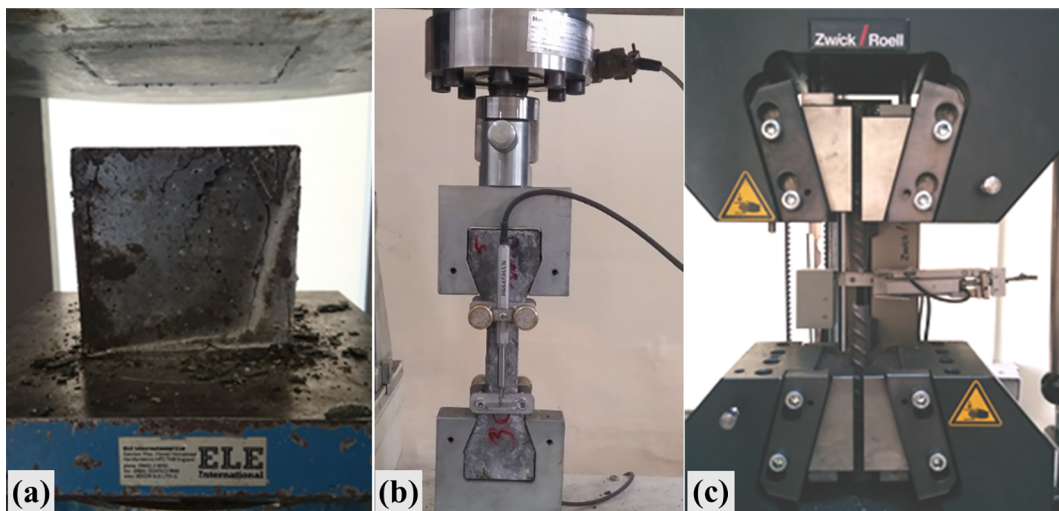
Material test specimens and setups; a) uniaxial compression test setup, b) direct tensile setup, c) coupon test of reinforcement.
